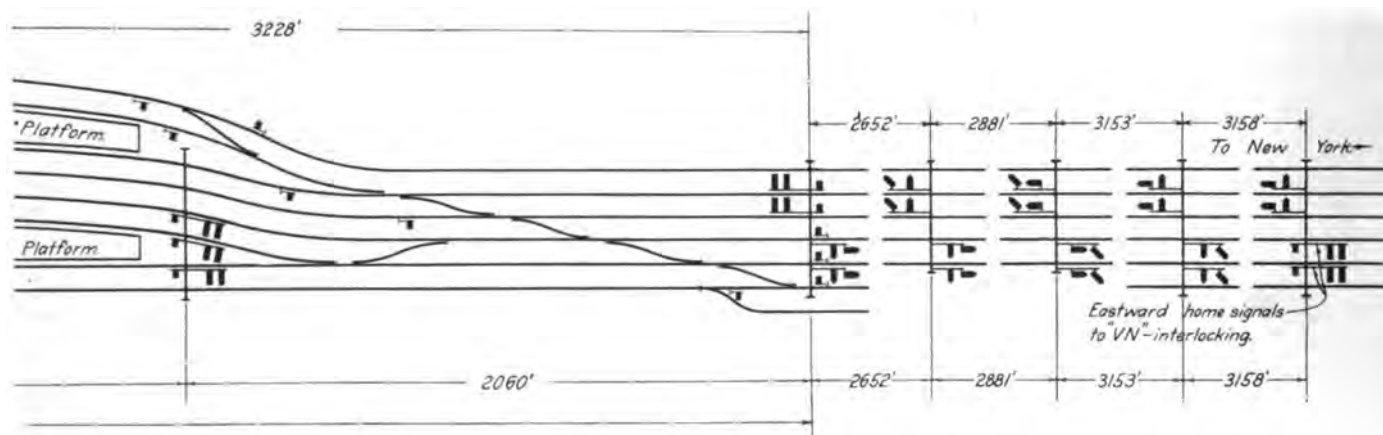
Track Plan and Signal Location at North Philadelphia.
